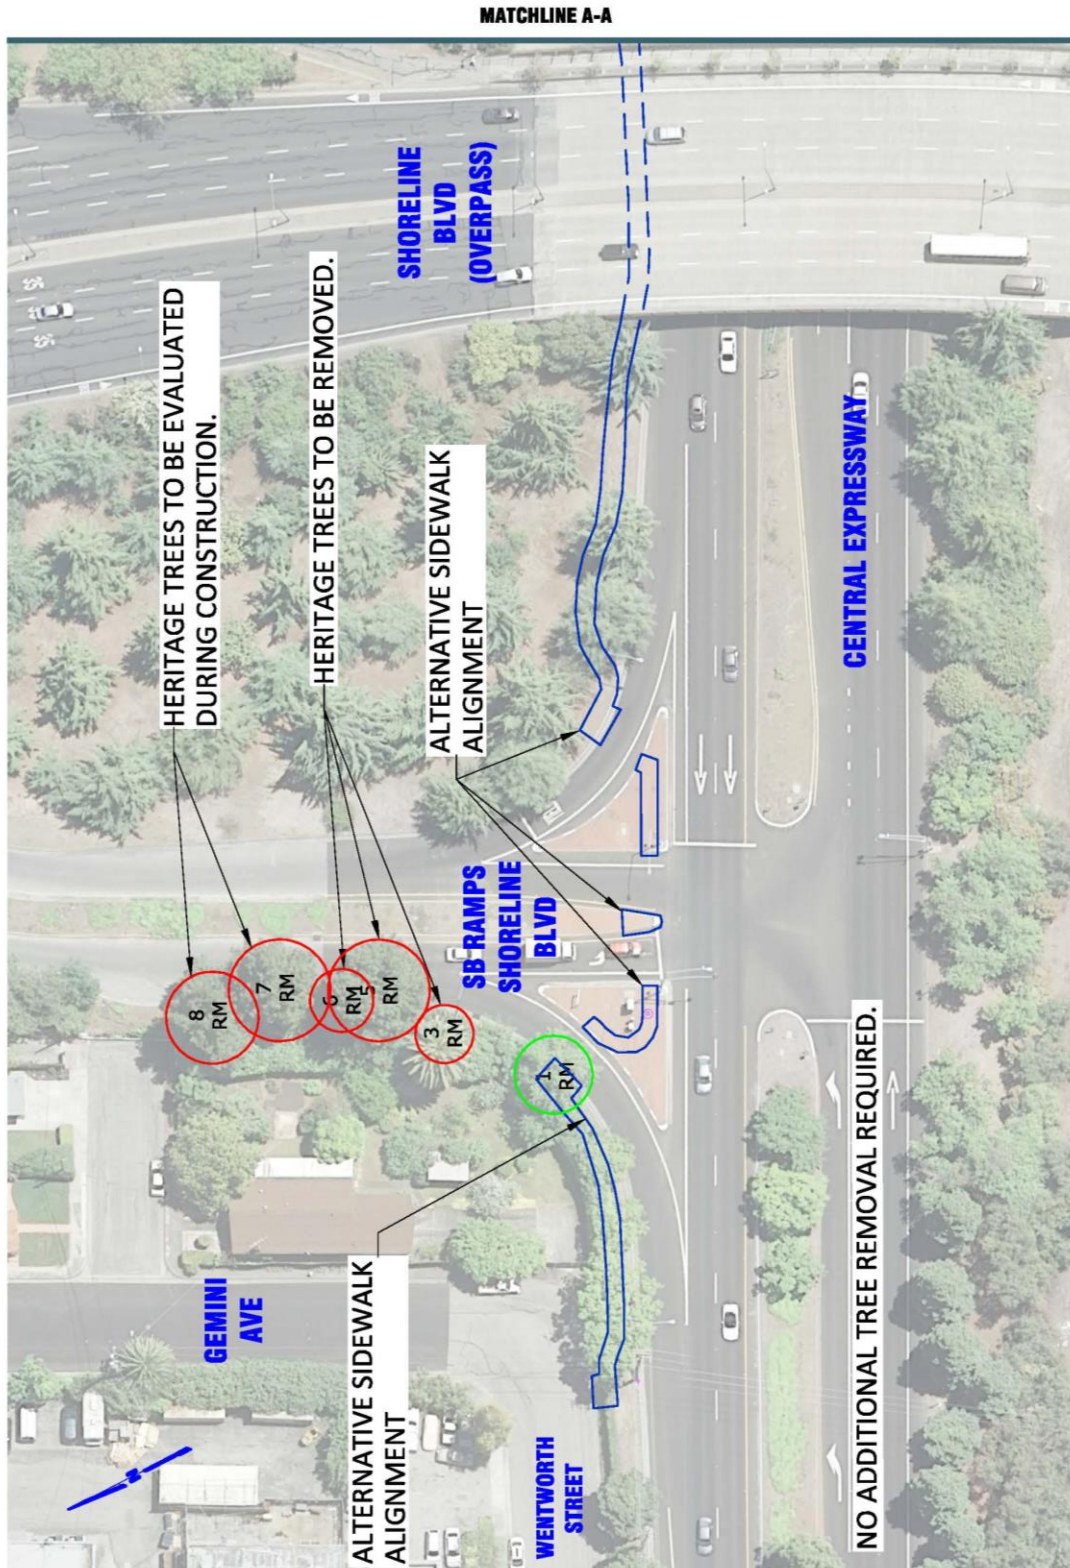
Exhibit J – Alternative Sidewalk Alignment and Tree Removal Locations
